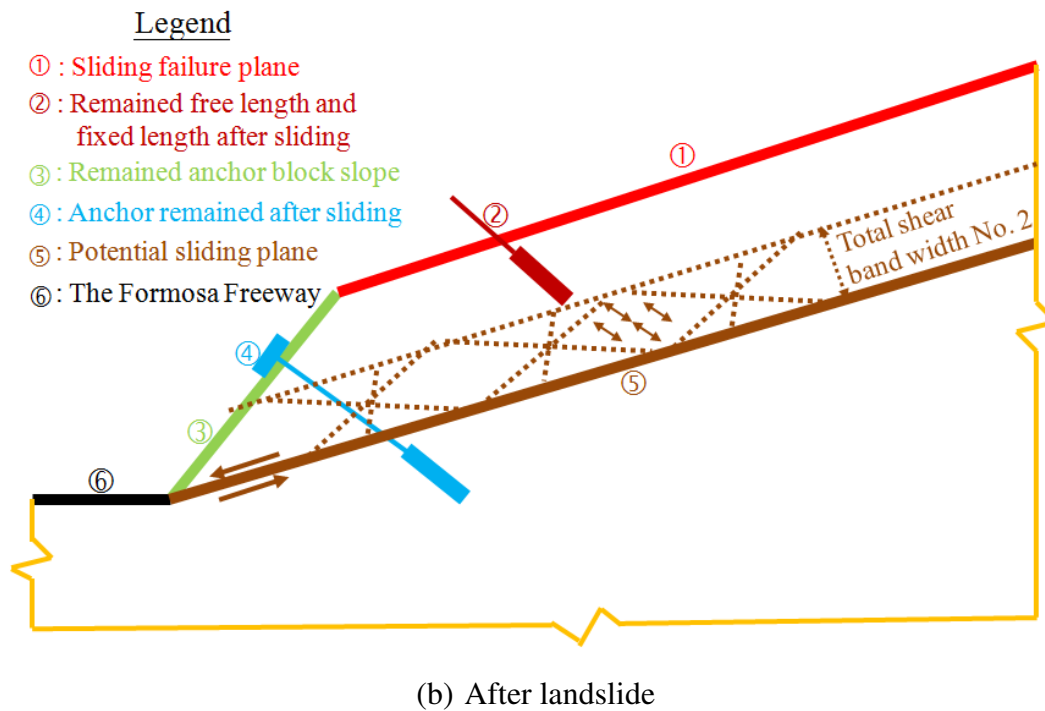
Schematic diagram of anchors, anchor components, and shear textures existing in the total shear band width that exists on the anchor block slope and sliding failure plane
